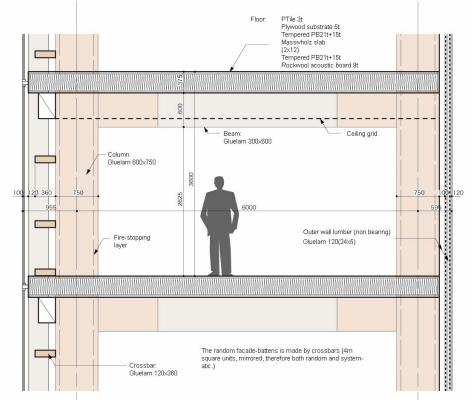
d - Detail: Section; Dimensions in [mm]
